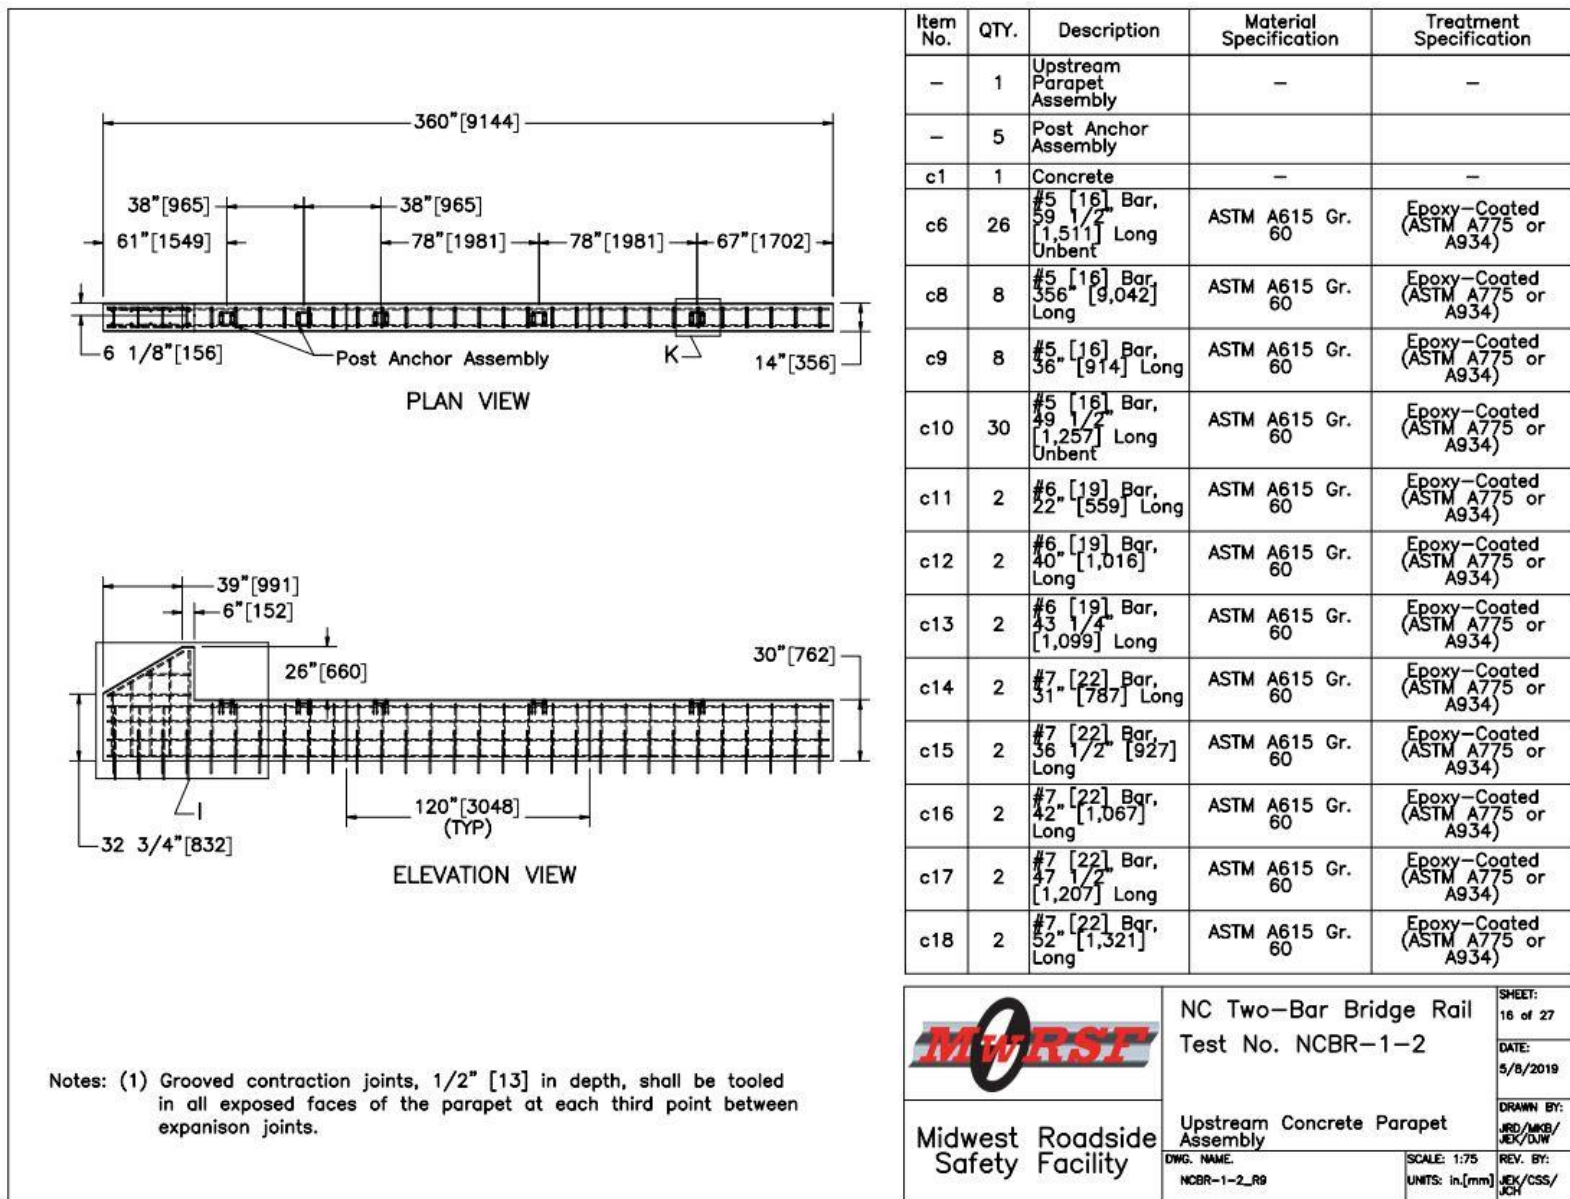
Upstream Concrete Parapet Assembly, Test Nos. NCBR-1 and NCBR-2
